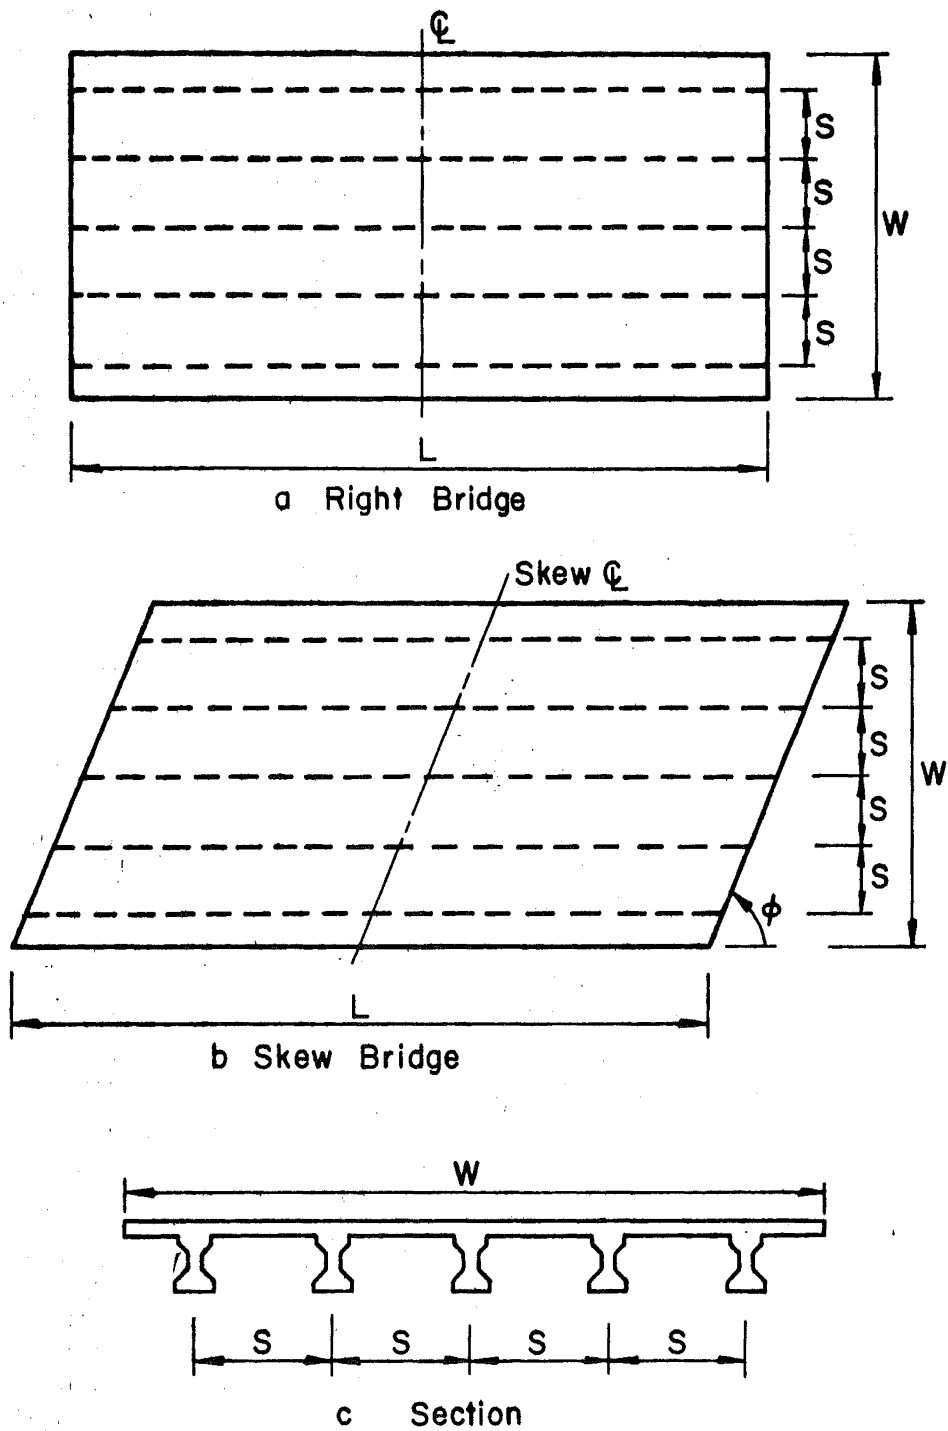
Plan and Cross Section of a Beam-Slab Bridge
